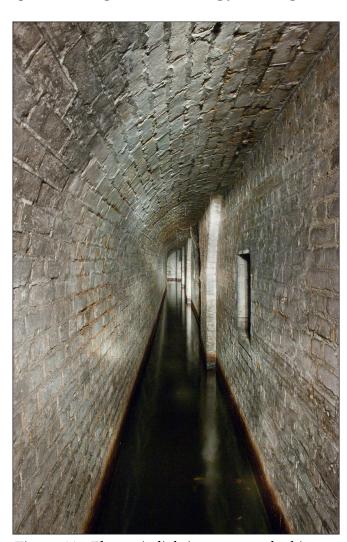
The main lighting passage looking south-west showing the restricted height of the passage and its slightly irregular vault. An opening for the light box in the end wall of the ammunition store can be seen in the wall on the right of the photograph. (DP097416)
